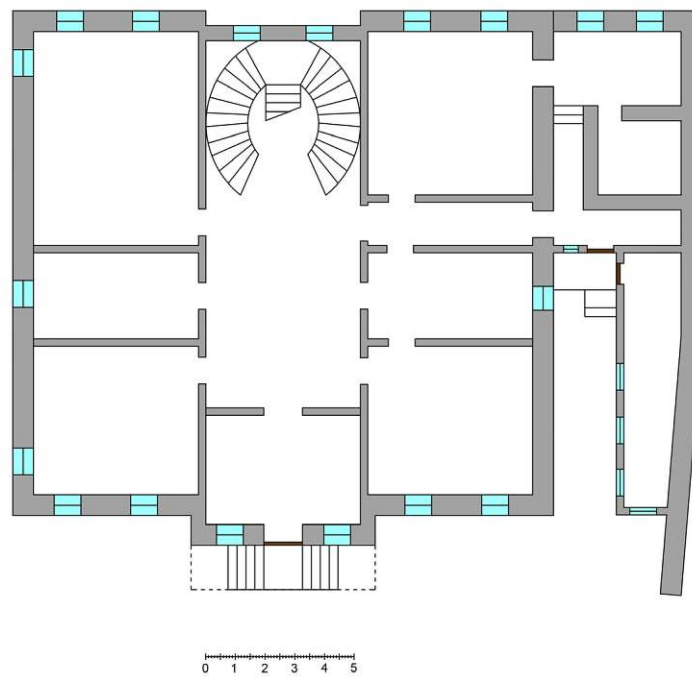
House of Dr. Stoyan Chomakov – ground floor plan
